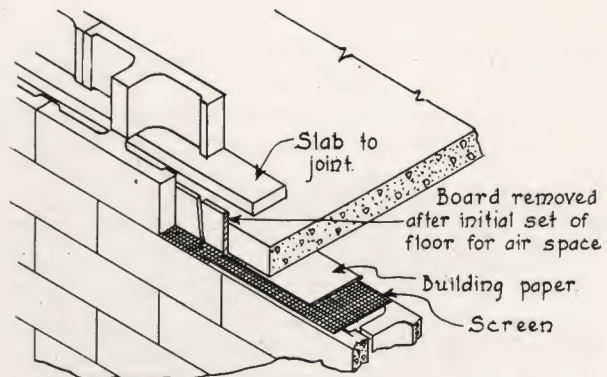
Method of supporting concrete floor on two-piece type of wall. An air space is provided between floor slab and outer wall.
